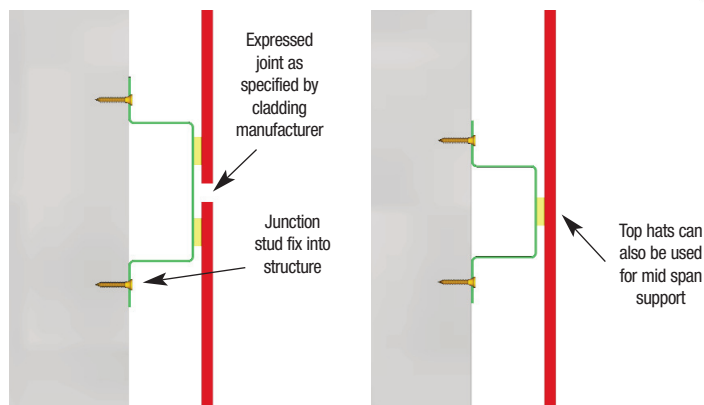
Top Hat Sections to Support Aluminium Composite Panel
